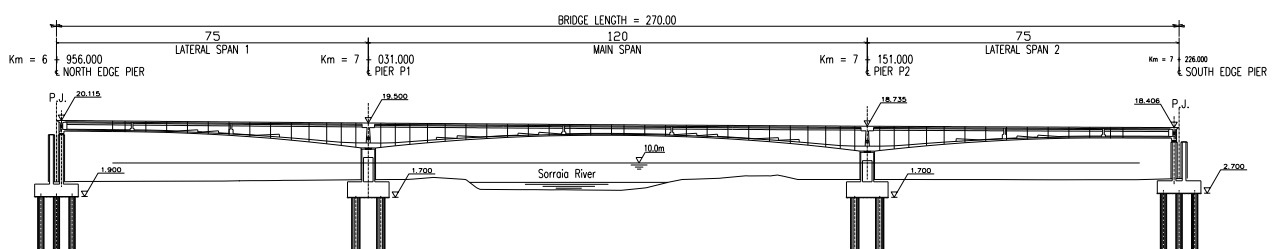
Side elevation of the cantilever constructed box-girder bridge over the Sorraia River [3].
